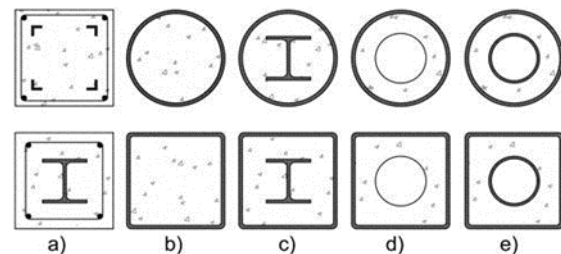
Composite columns: (a) Concrete encased steel (CES), (b) CFST, (c) combination of CES and CFST, (d) hollow CFST sections, (e) double skin sections.
